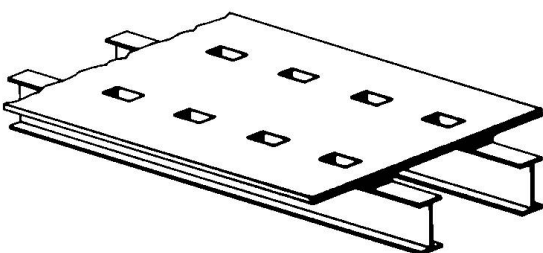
A precast concrete slab launched on the steel structure with pocket, to later weld Nelson studs.
